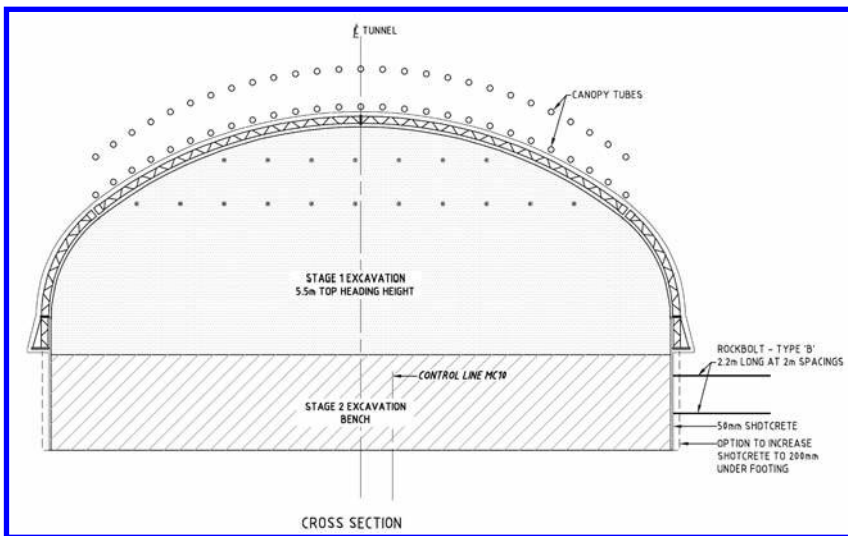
Cross section through the tunnel showing 27 canopy tubes over the tunnel arch.
